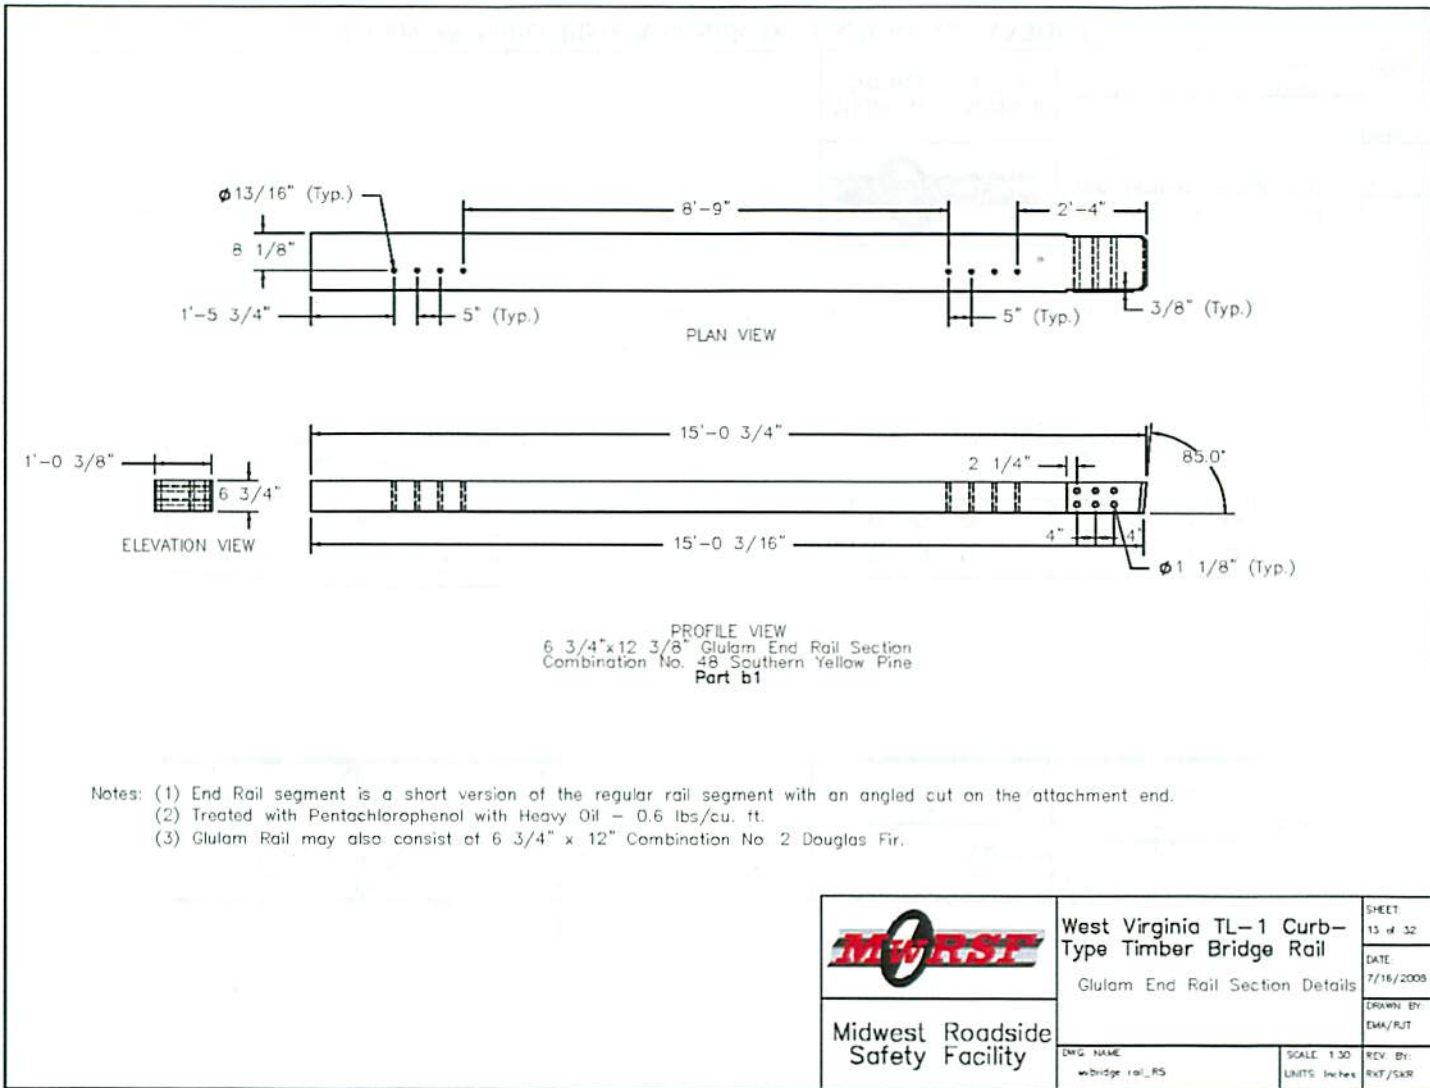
Glulam Rail End Segment Details, Test No. WVBR-1
